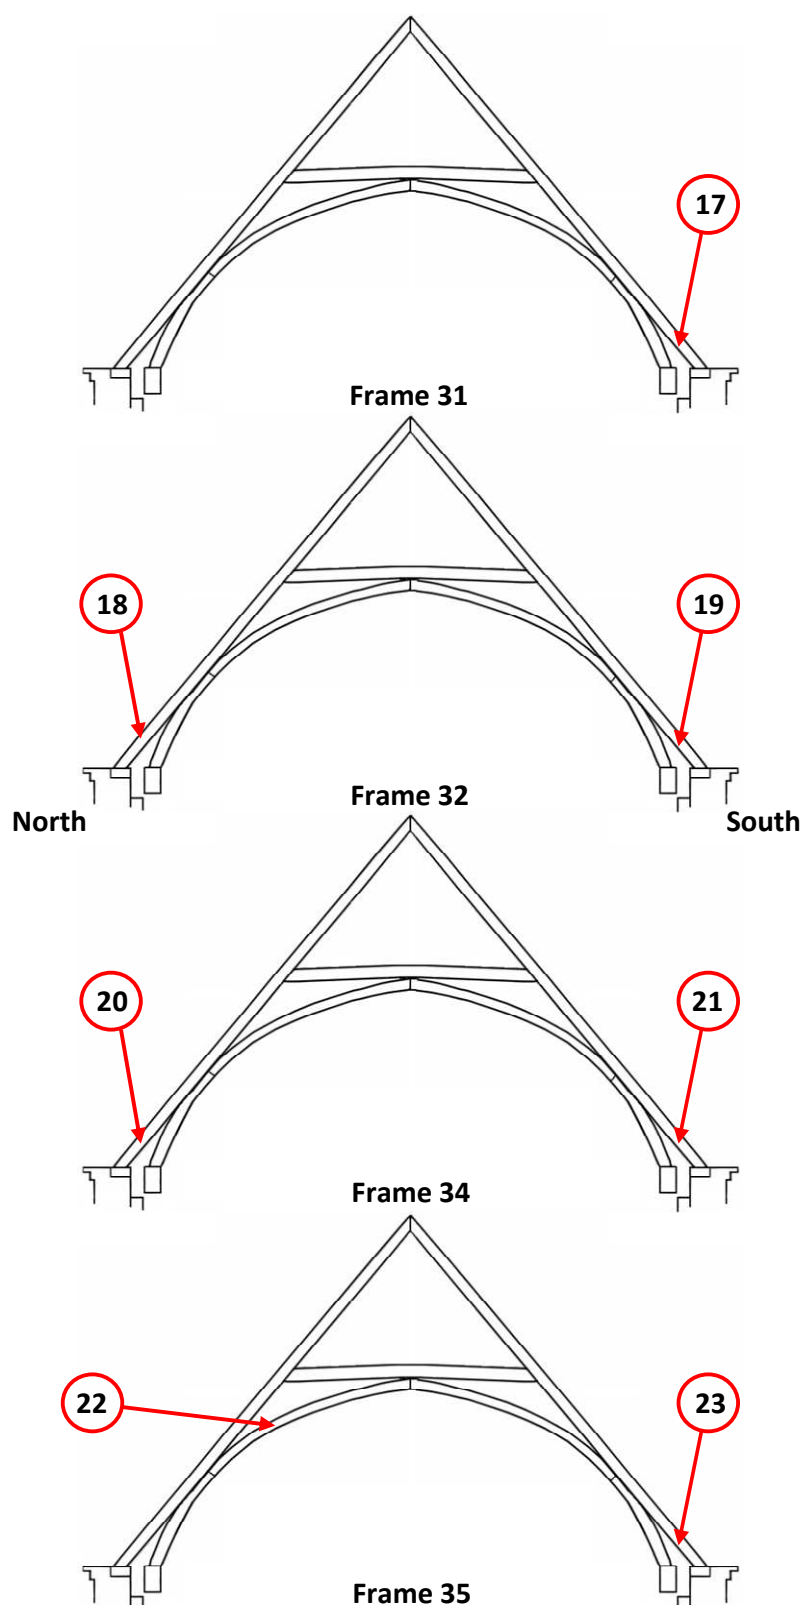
d: Drawings of the frames to locate sampled timbers (after Beauchamps Chartered Surveyors)
